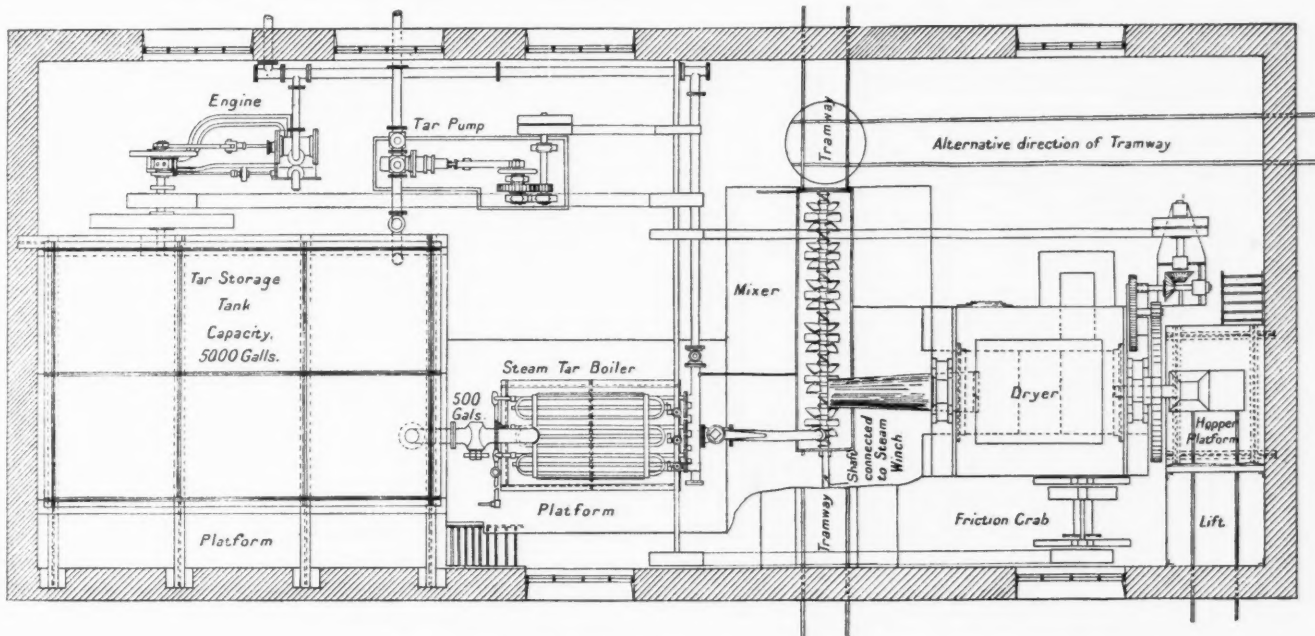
PLAN OF TAR MACADAM MIXING PLANT
